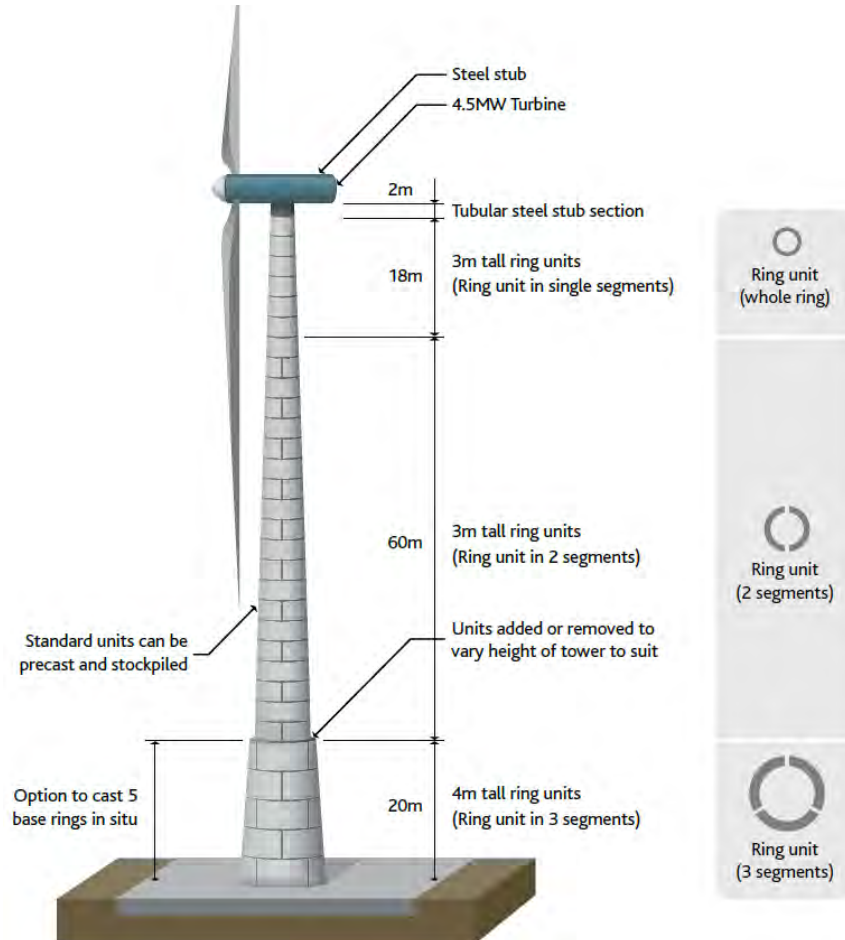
Details of Precast Concrete Towers (The Concrete Centre, 2005)
